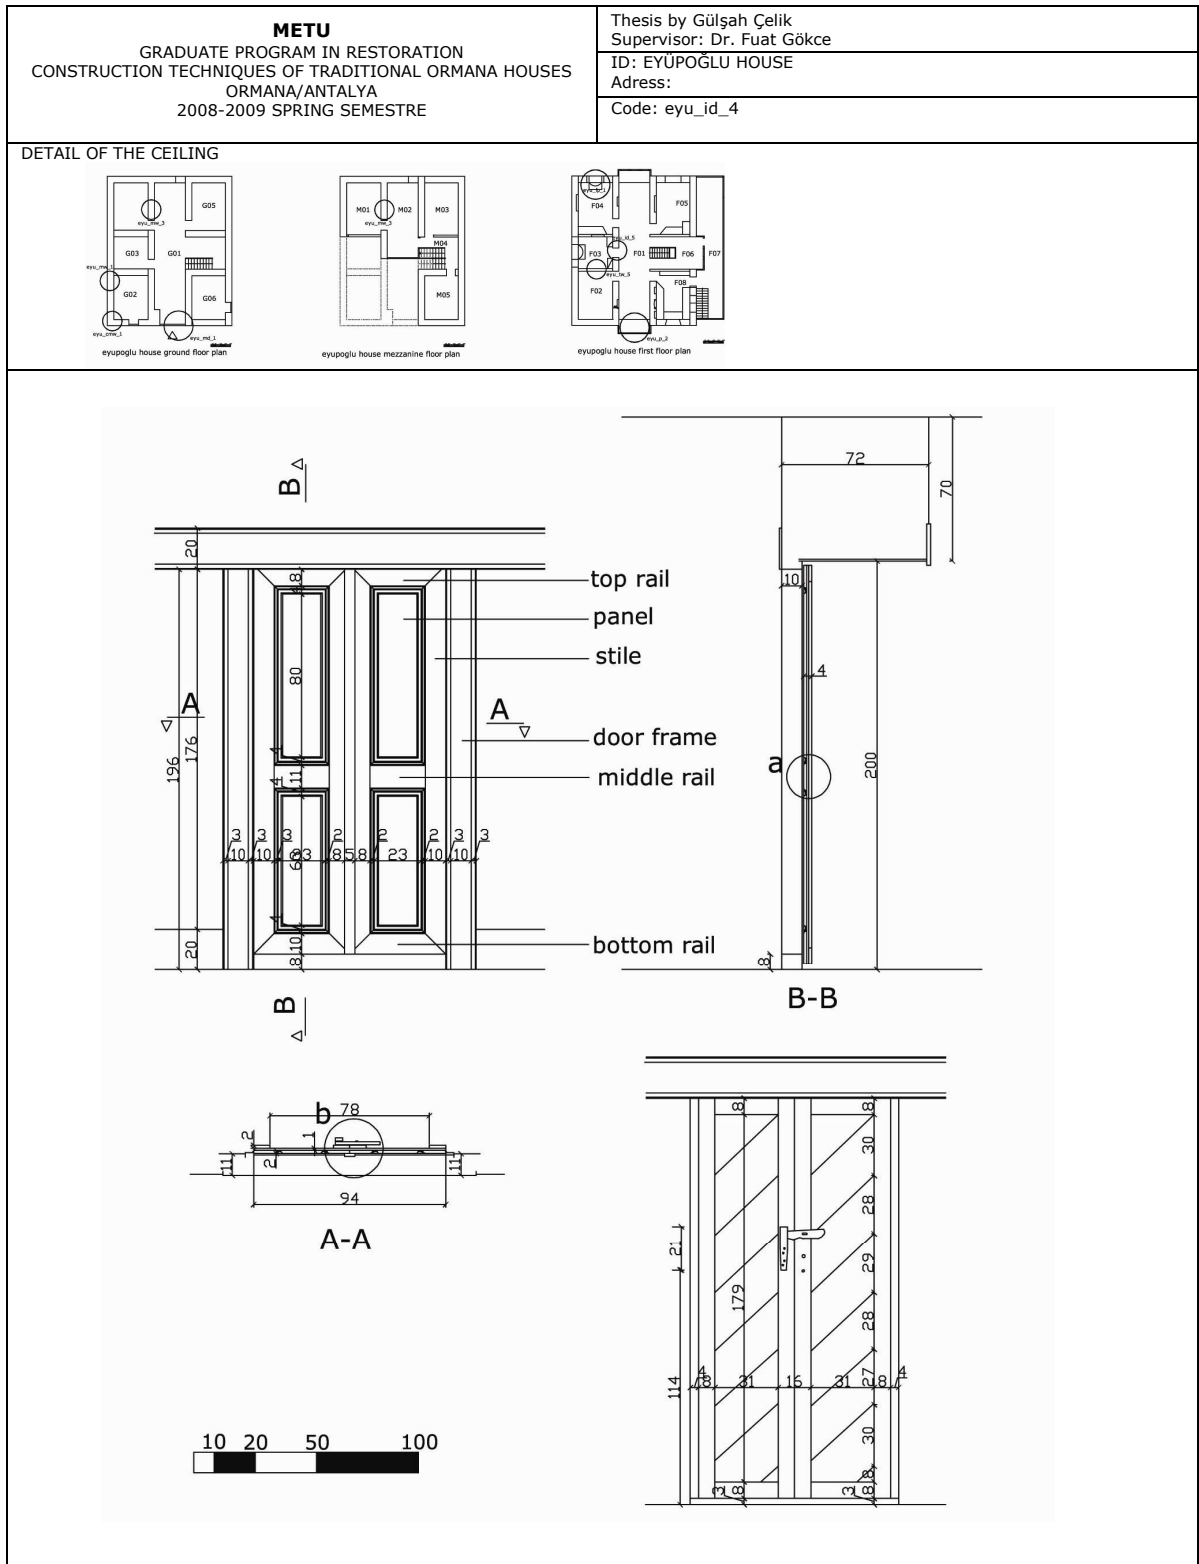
View from the ceiling of the Eyüpoğlu House. Çelik, 2008.
